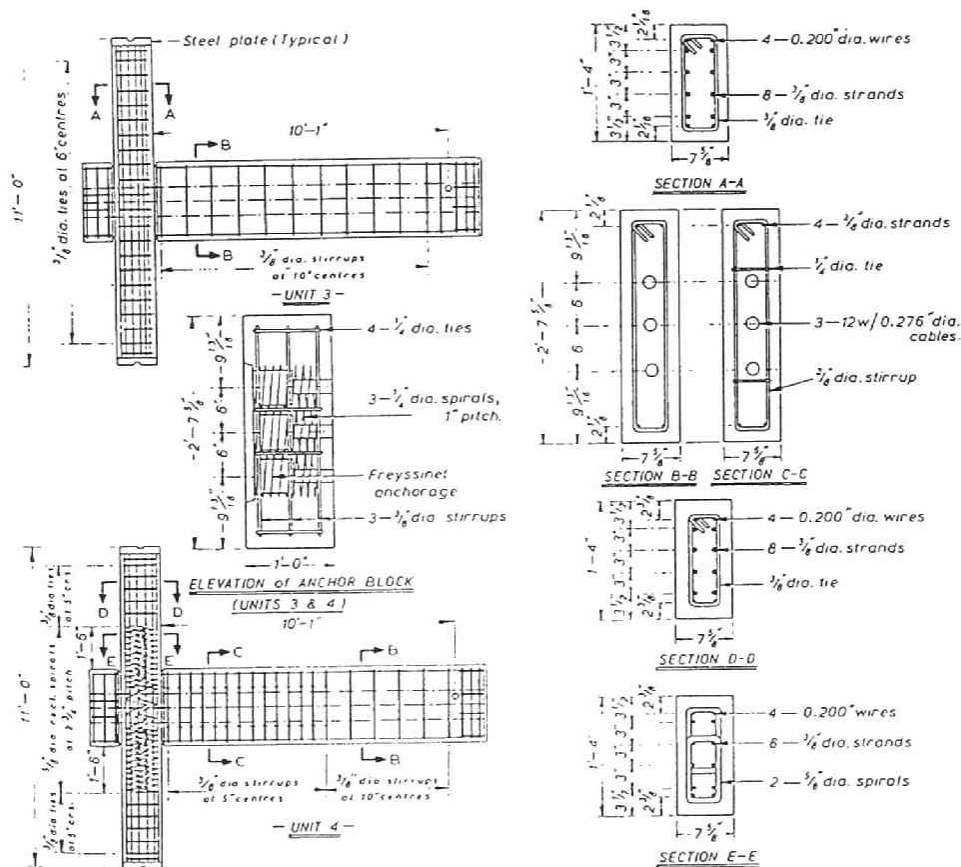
(b) Precast prestressed concrete beam - column assembly test units (Units 3 and 4) by Blakeley and R. Park [4.1]
